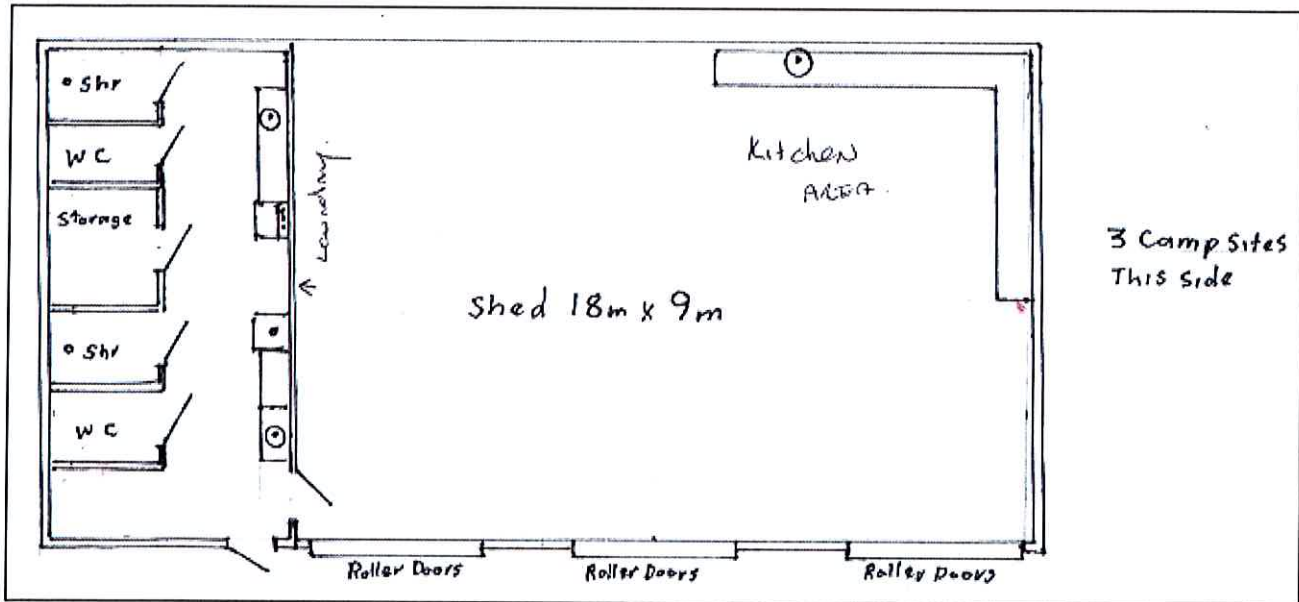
CONCEPT PLAN OF THE ABLUTION AND KITCHEN BUILDING (3x sites are shown and another 3x sites will be provided on the other side of the facility).
